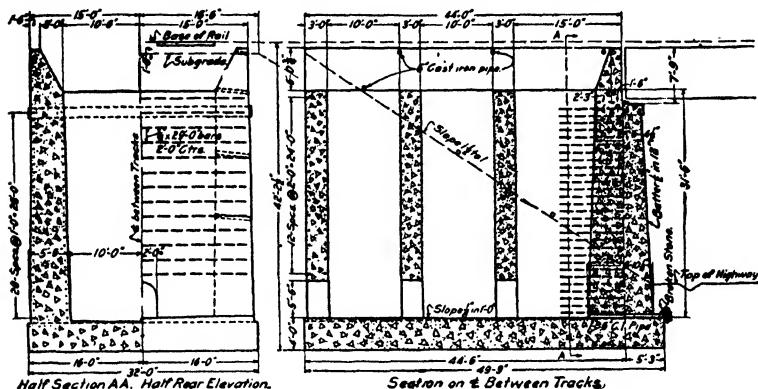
Typical U-abutment for Short Plate Girder Spans, Milwaukee, Sparta, and Northwestern Railway.
